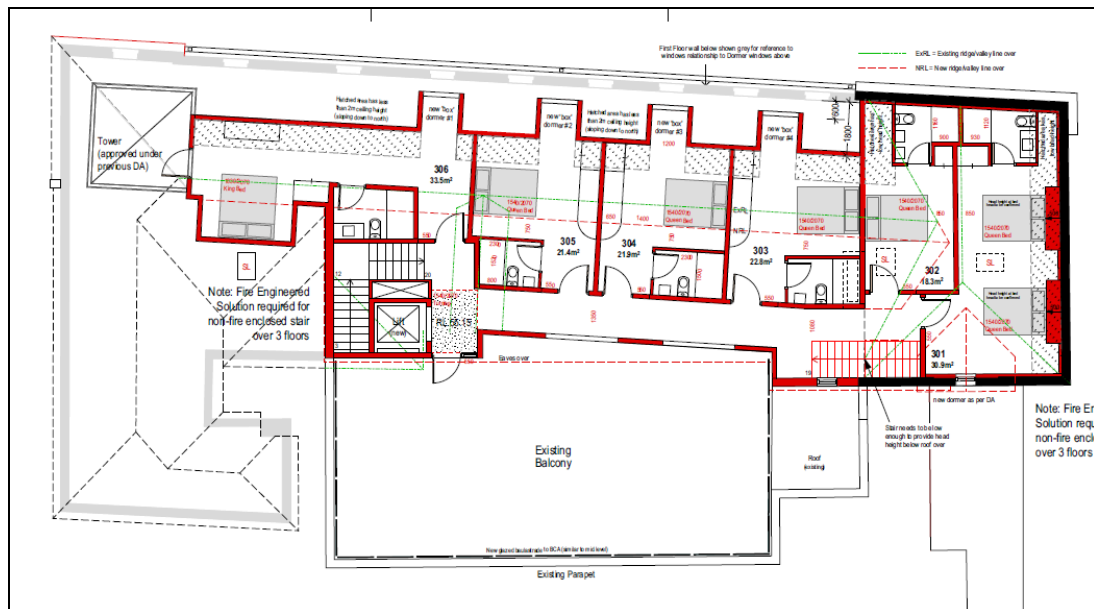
Extract of final Second Floor Plan with the rear balcony retained
